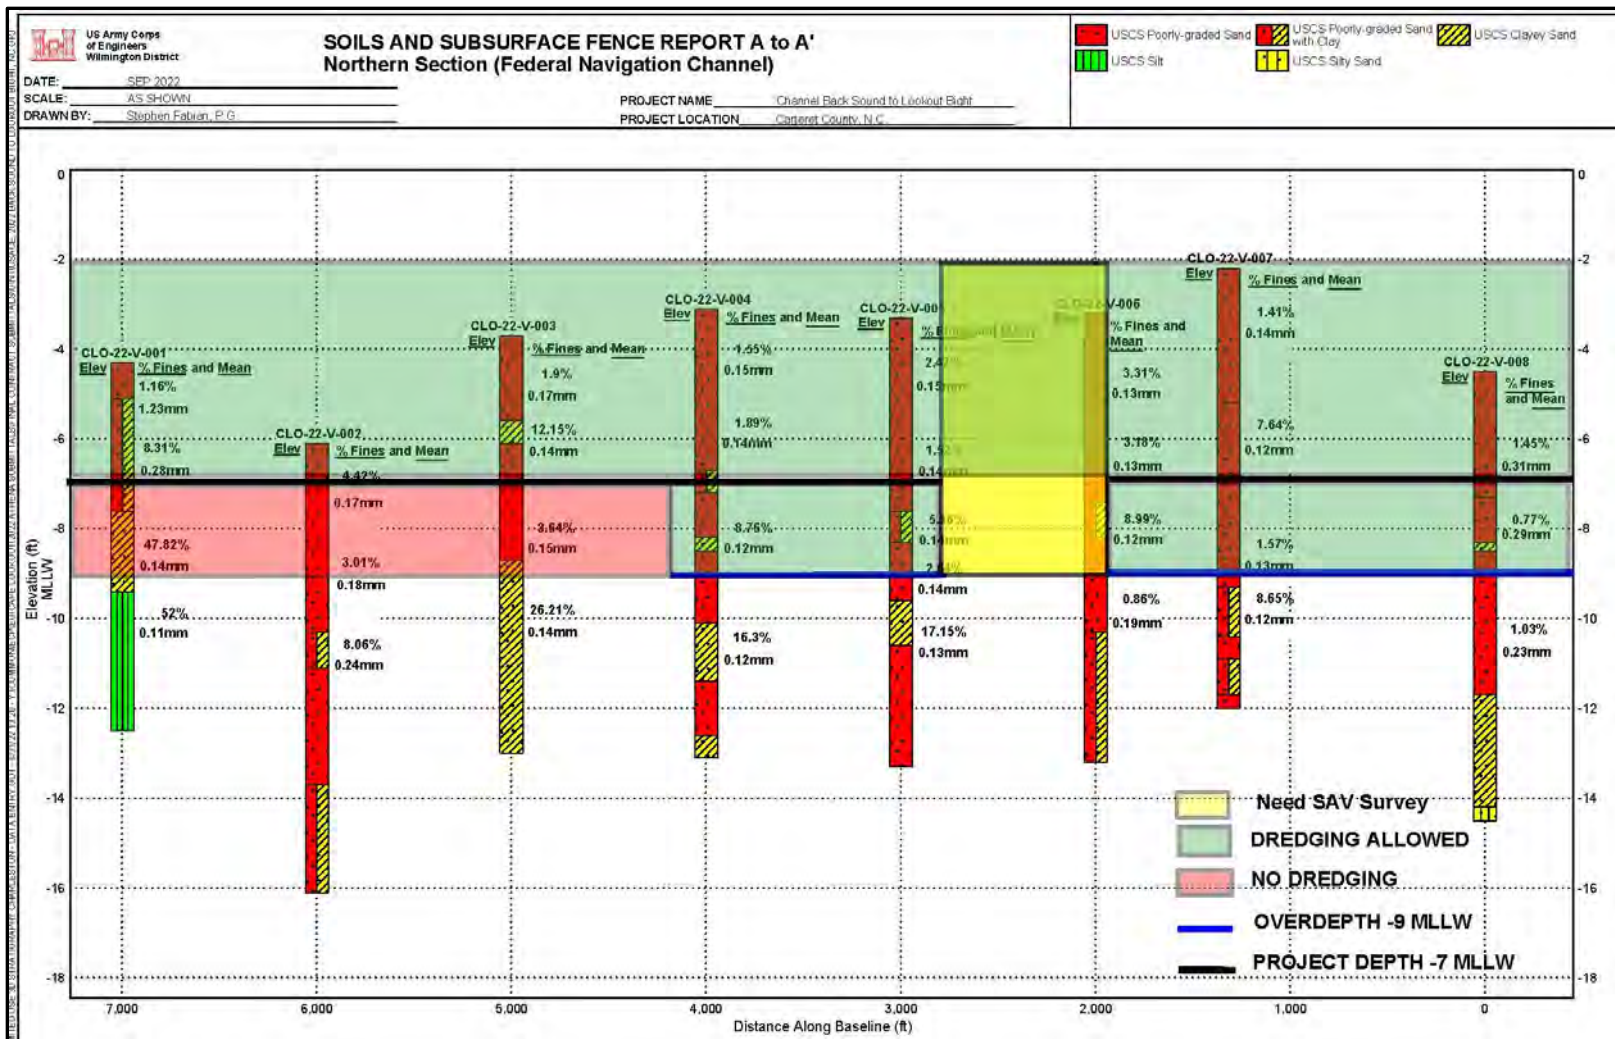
Cross section A to A' showing allowable dredge areas throughout the northern section.
